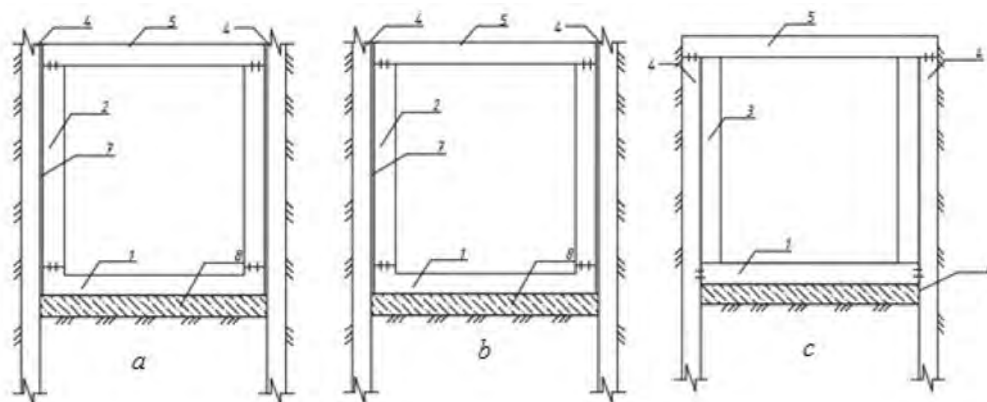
Variety of methods of construction of underground structures made of cast reinforced concrete: a – cut and cover method with backfill slots; b – cut and cover method without backfill slots; c – cut and cover and semi-closed-cut method with slab (cover) spacing discs, with a load-bearing 'diaphragm wall'; 1 – buckle (foundation) slab; 2 – bearing wall; 3 – pressure wall; 4 – excavation wall (in part b – bearing structure); 5 – floor slab (cover); 6 – cavities for backfilling; 7 – sliding plane (plane of mutual shift of the walls); 8 – concrete foundation mattress.
